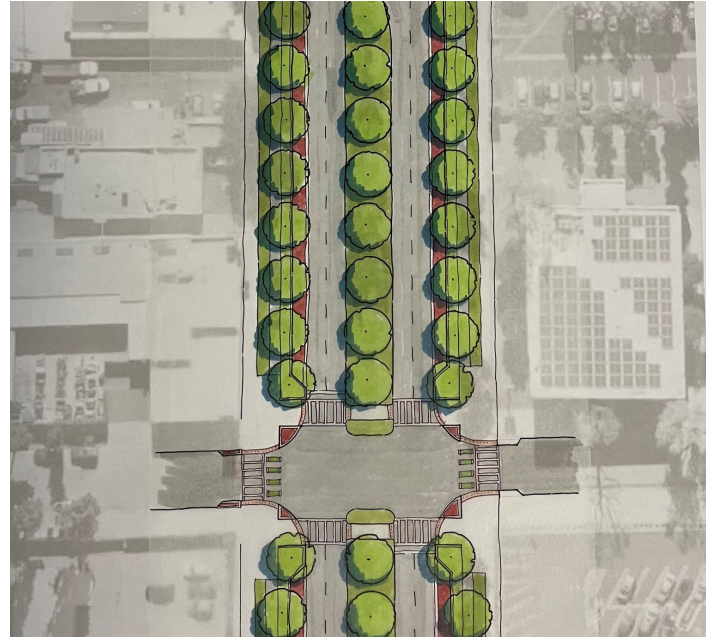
Proposed intersection plan for Fair Oaks Avenue at the Middle school crossing
